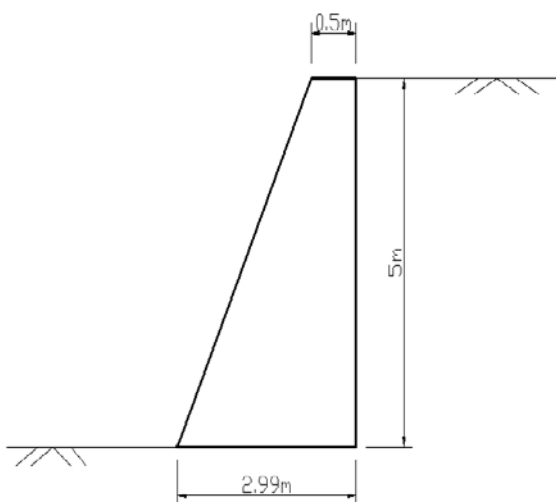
Structural dimension of retaining wall in the area of Woodland Hills , CA.
